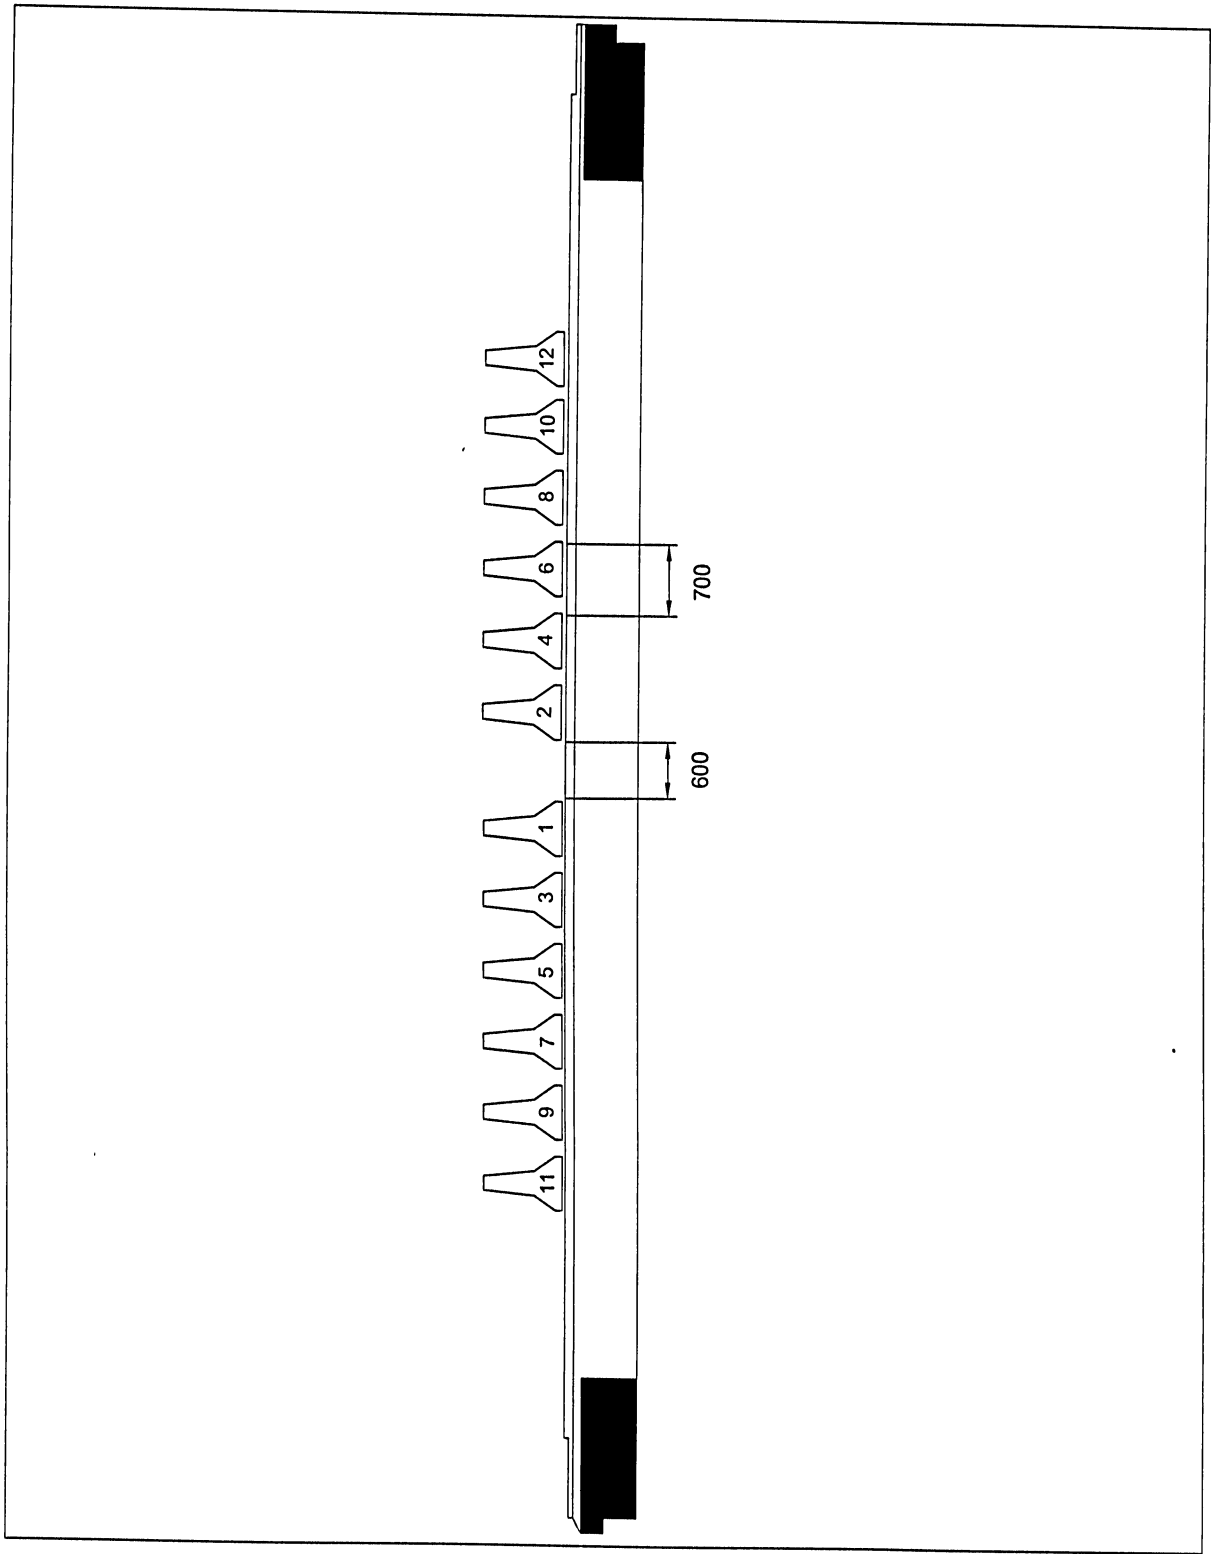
DT-100 girder barrier load application (Cofini, 2005)
